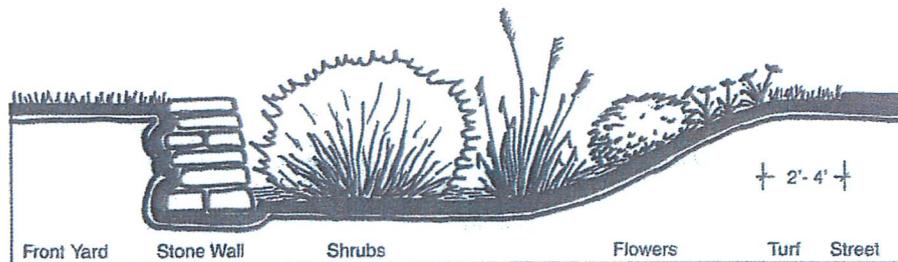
High-Volume, Asymmetrical Rainwater Garden with Masonry Wall
